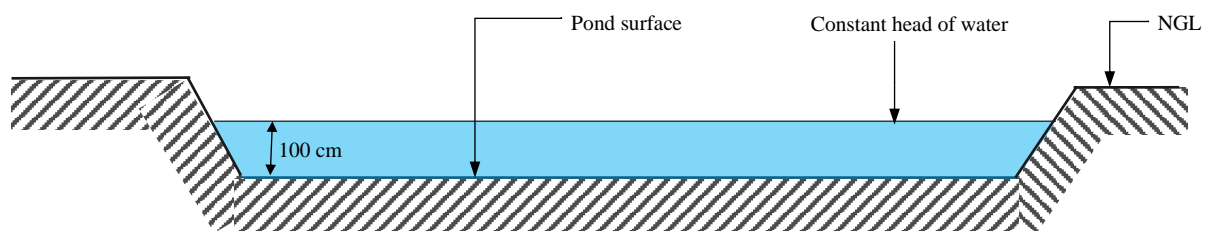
Schematic of a typical stormwater pond with 100 cm constant head of water
